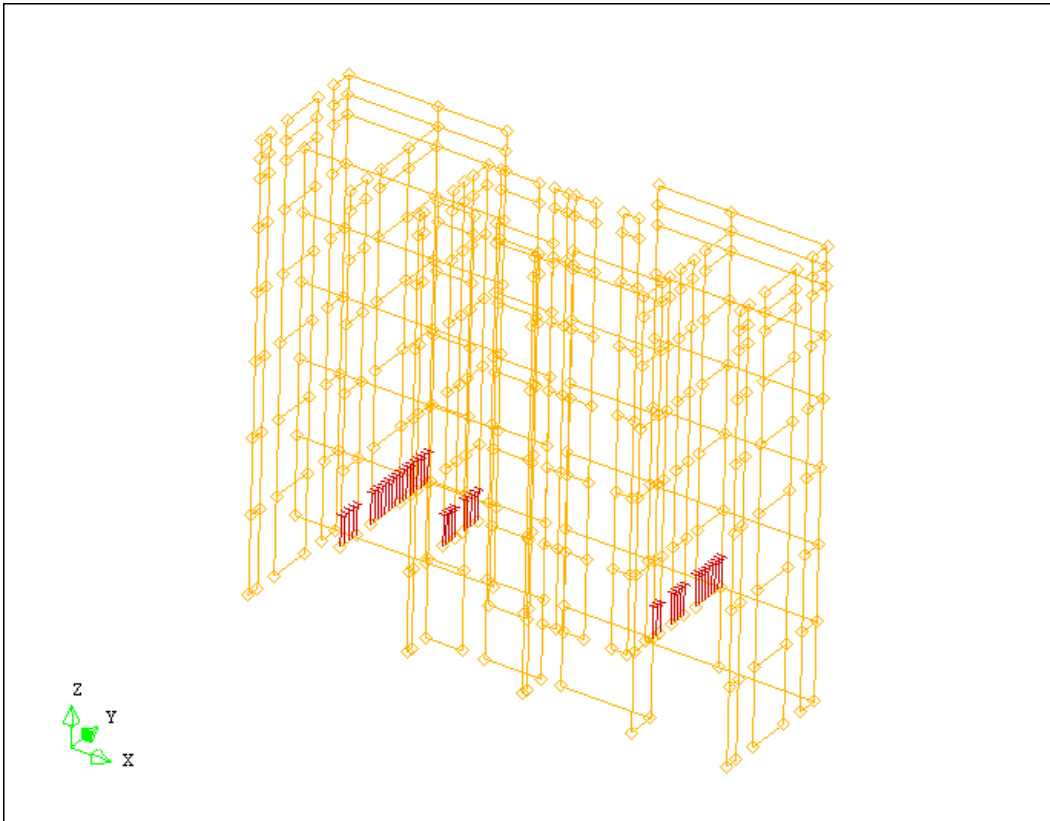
Model 2 – Vertical constraints at removed ground floor walls
